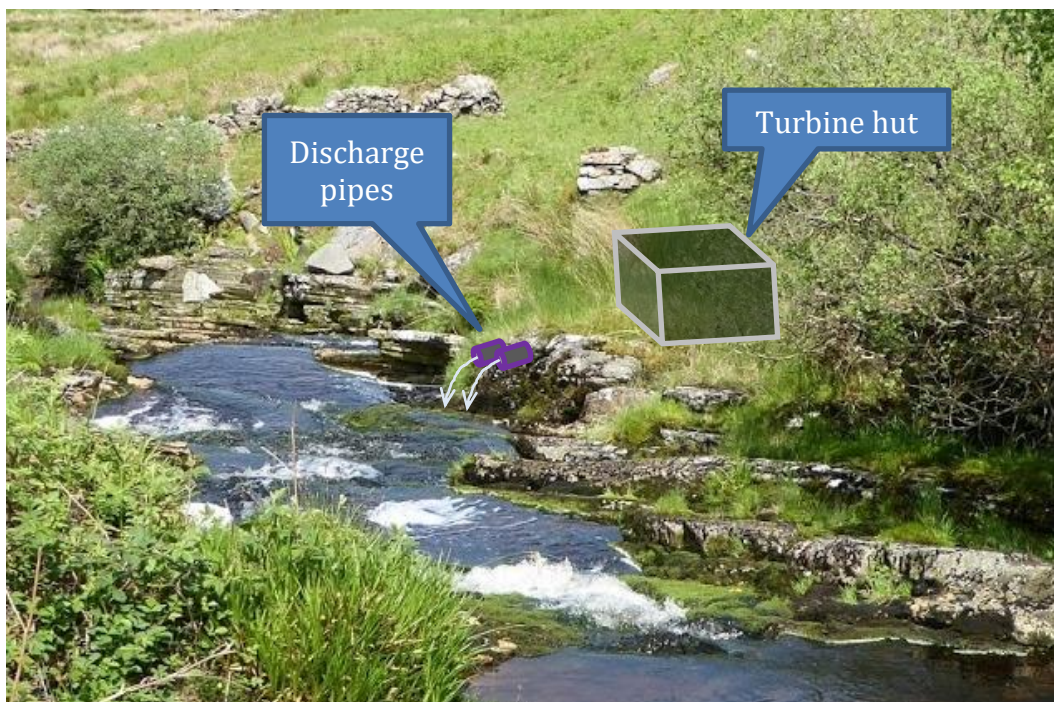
Each turbine will have a pipe of at least 140 mm bore discharging into the river. The diameter will be sufficient for the water to run out (like a waterfall) as opposed to squirting as a jet.
